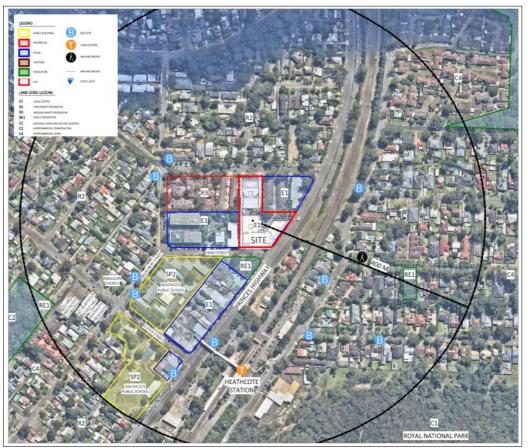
Site Location Plan - DA-0-101 (source: Dickson Rothschild)
